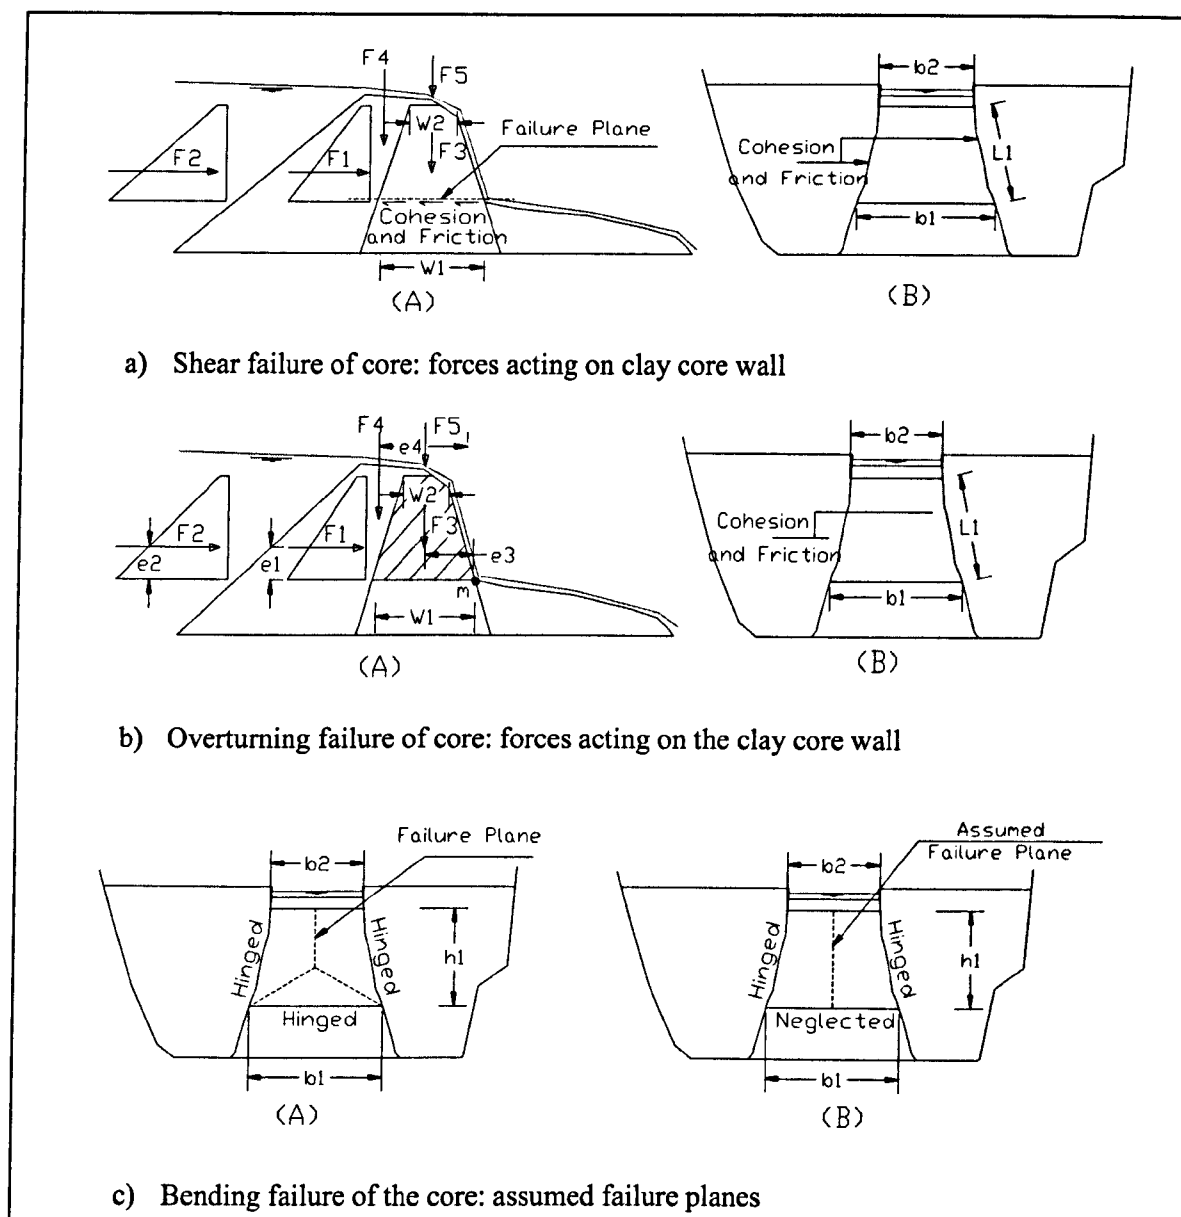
Structural failure mechanisms used for composite dam breach (Mohamed, 2002)
